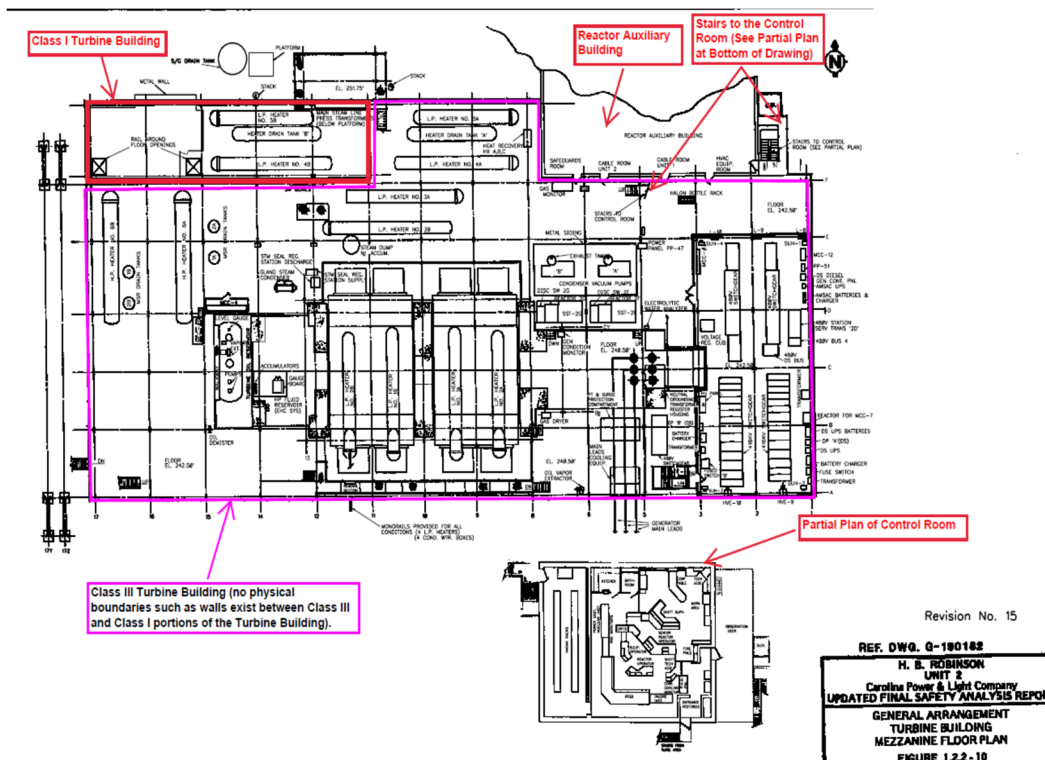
Layout of the Turbine Building at the Mezzanine Level
